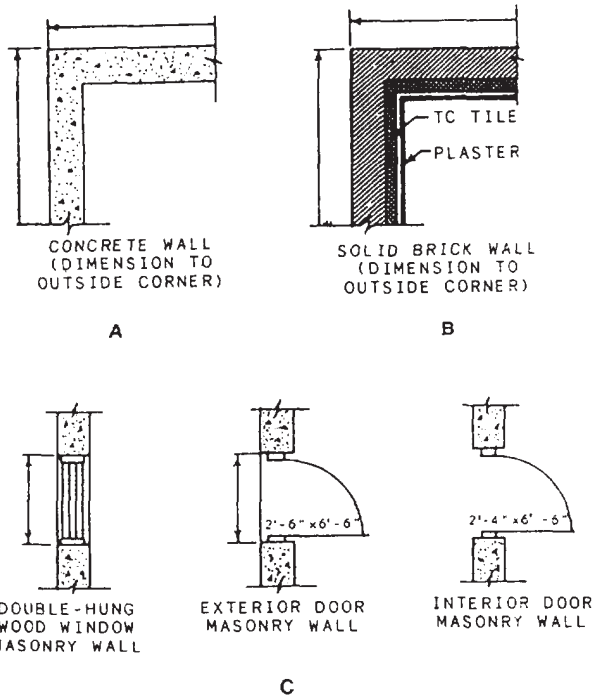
Dimensioning concrete-masonry construction; window and door openings.
